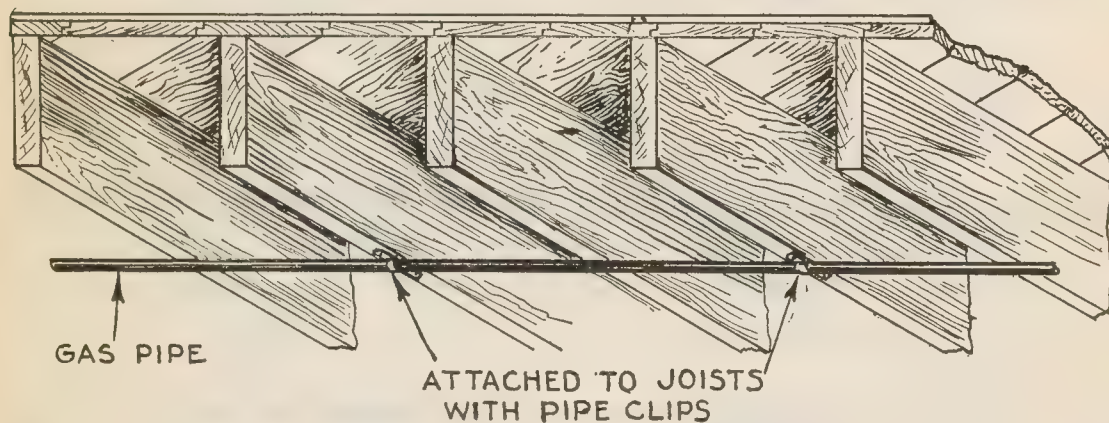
,017.—Right way of running pipe in cellar by hanging from joists instead of supporting on wall.
